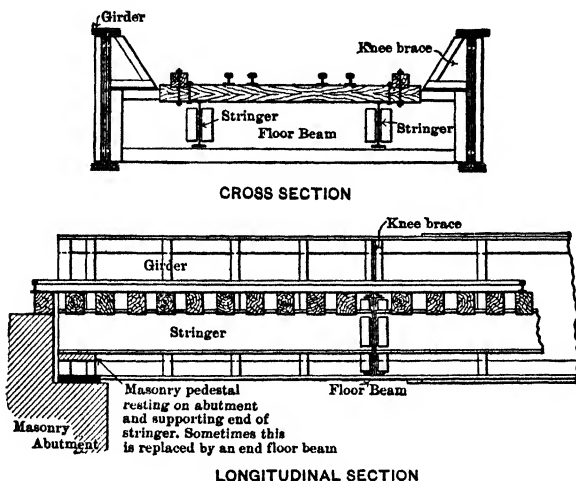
Half-through single-track plate-girder railroad bridge.
